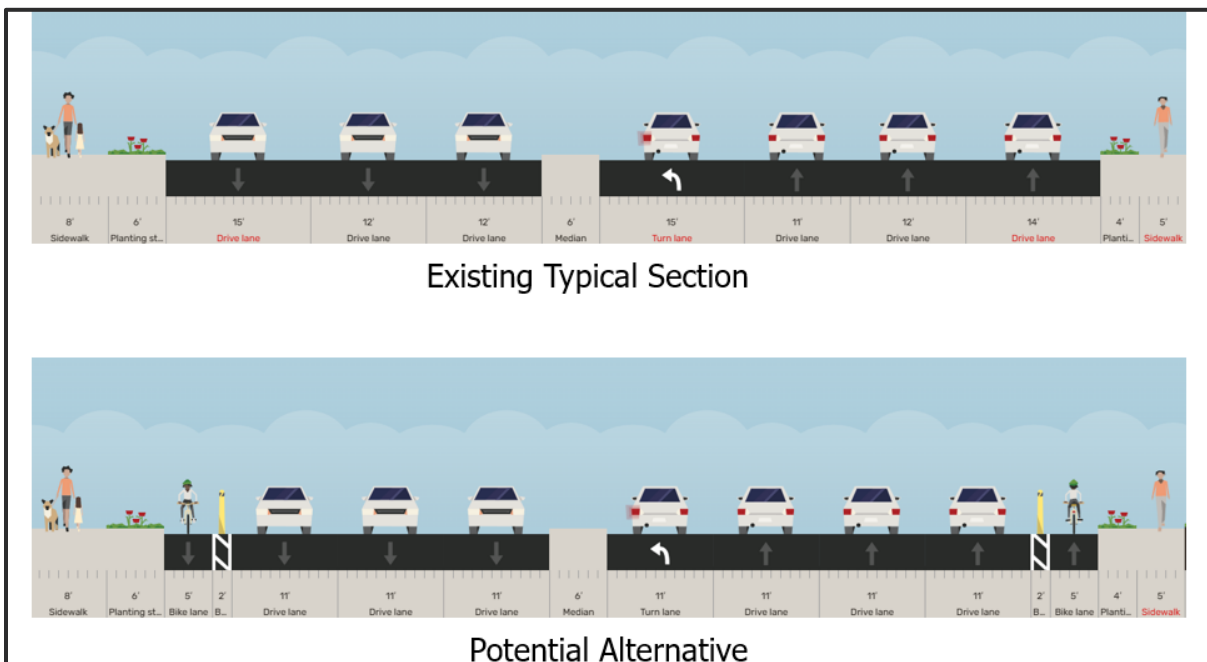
Forest Hill Boulevard Existing and Potential Alternative Typical Section
